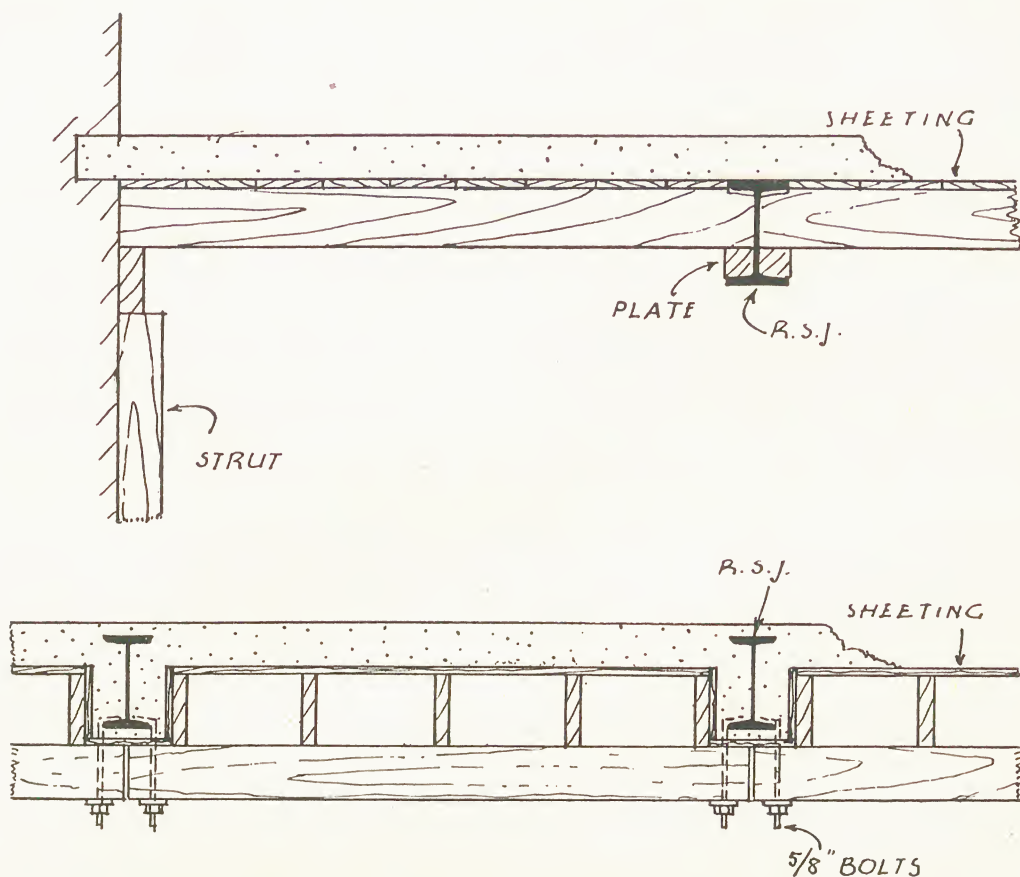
(Top) Concrete floor on top flange of R.S. joists. (Bottom) Concrete floor on haunched R.S. joists.
